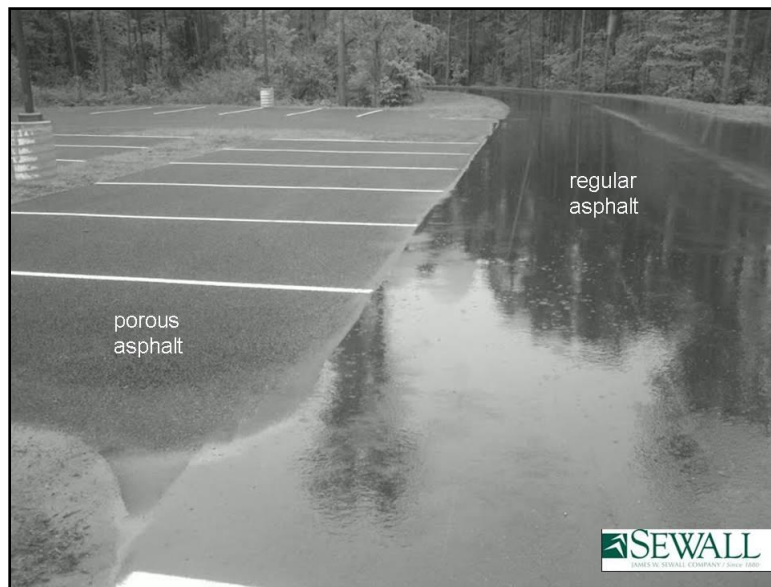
Porous Pavement (left) and Normal Pavement (Right)
